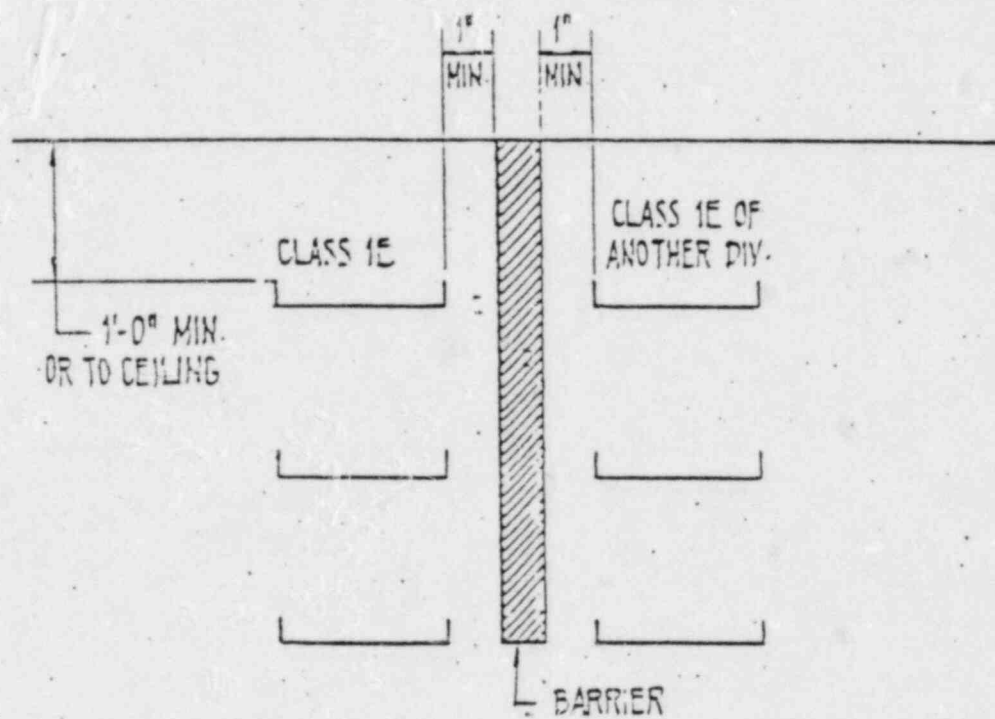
ARRANGEMENT WHEN HORIZONTAL SPATIAL
